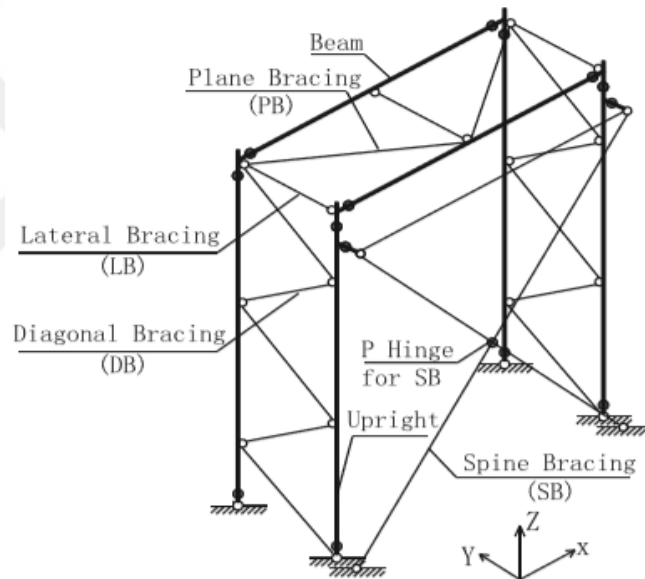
Typical rack structure with diagonal, plane and spine bracings [35]
